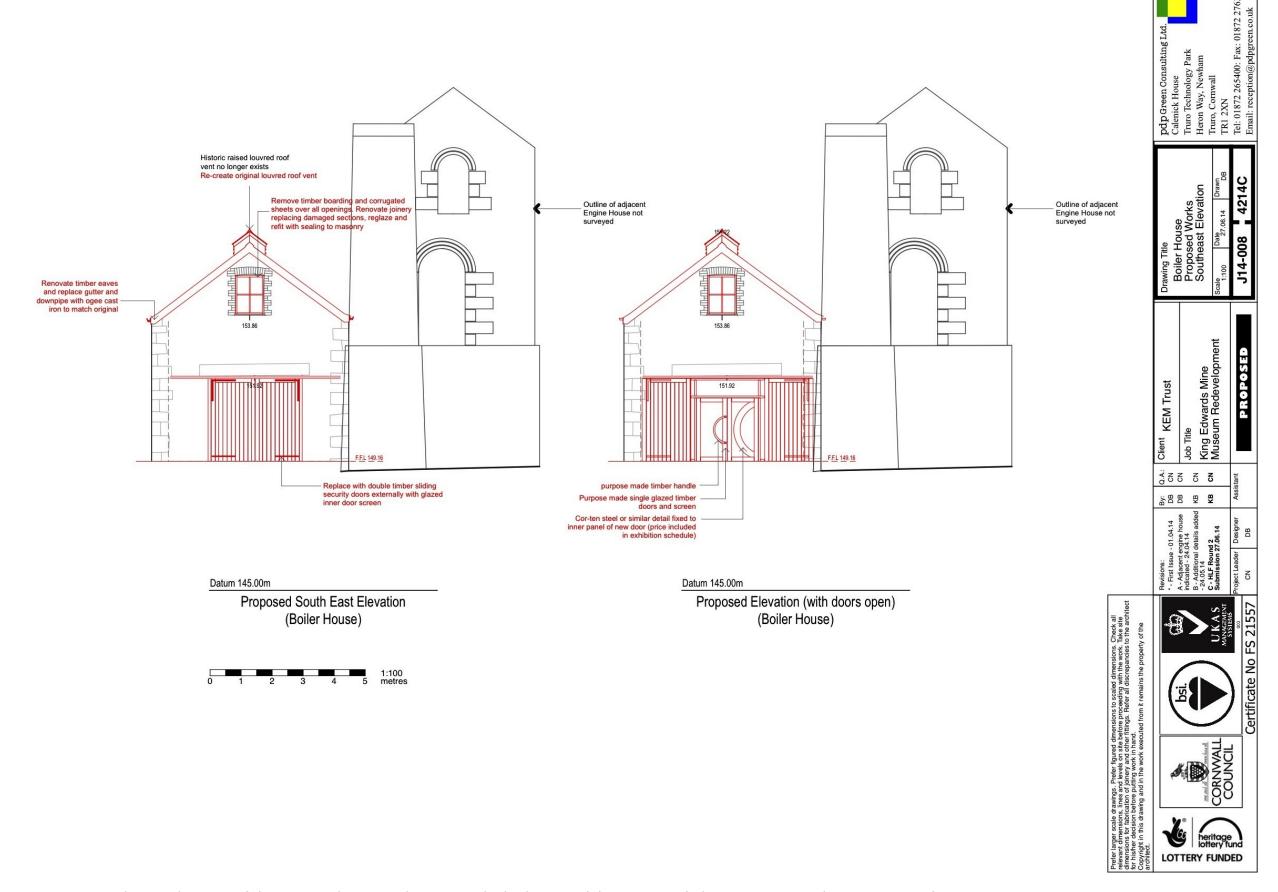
South east elevation of the proposed new winding engine boiler house exhibition space (PdP Green Cons. Ltd Dwg No.4214C)
